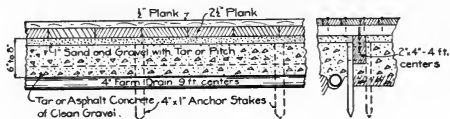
Detail of Asphalt or Coal-Tar Concrete Floor.
